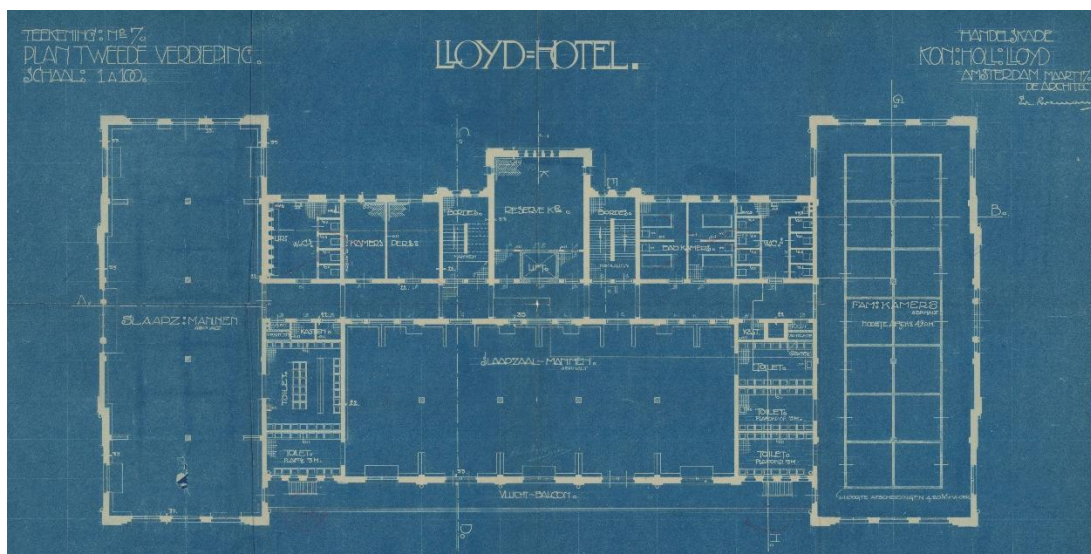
Floorplan second floor Lloyd Hotel ((Gemeente Amsterdam Archief; 24527; 10200290, 1917)
